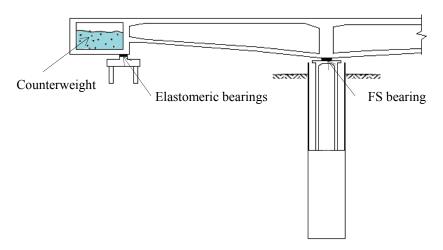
Elevation of a highway bridge over Corinth Canal (Constantinou et al., 1998)
